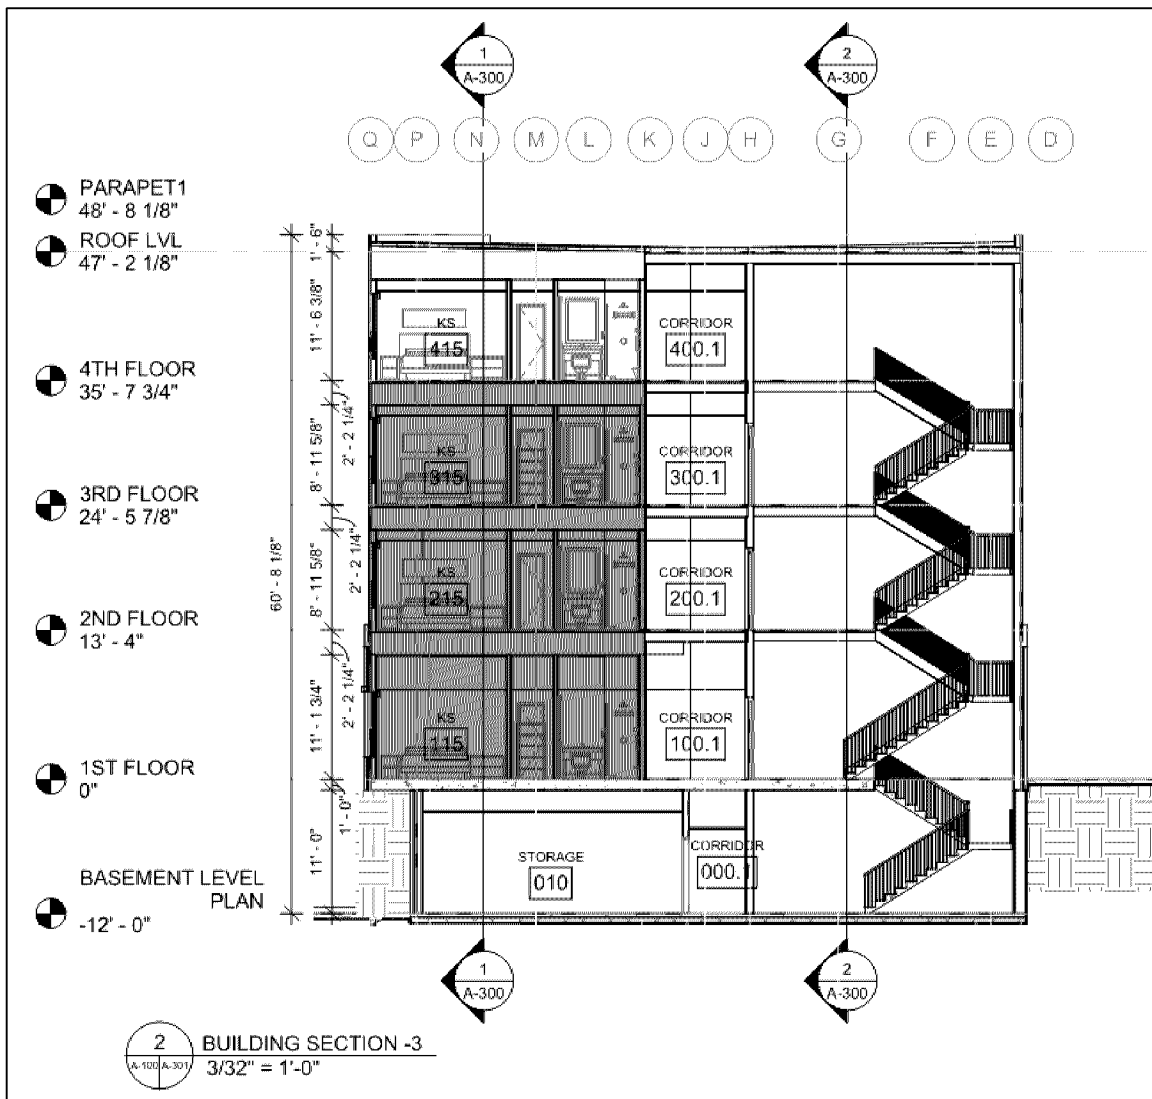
Base4 building section showing a guest room with roof and wall exposure (highlighted yellow) and guest rooms with only wall exposure (highlighted green).
